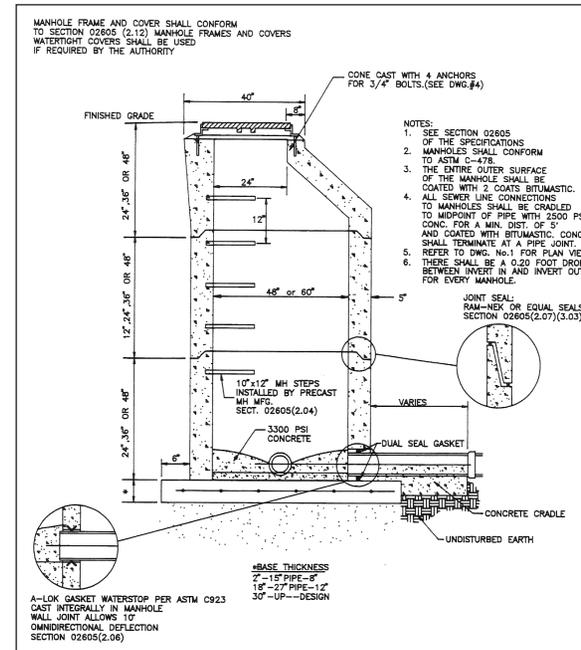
f. Typical Manhole Showing Precast Base and Wall Sections
